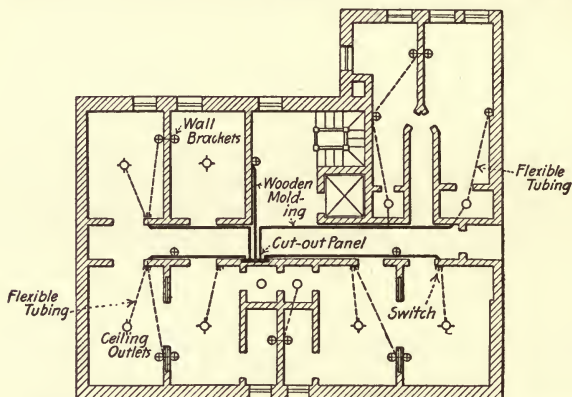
Wiring of an apartment using wooden molding and flexible tubing.
